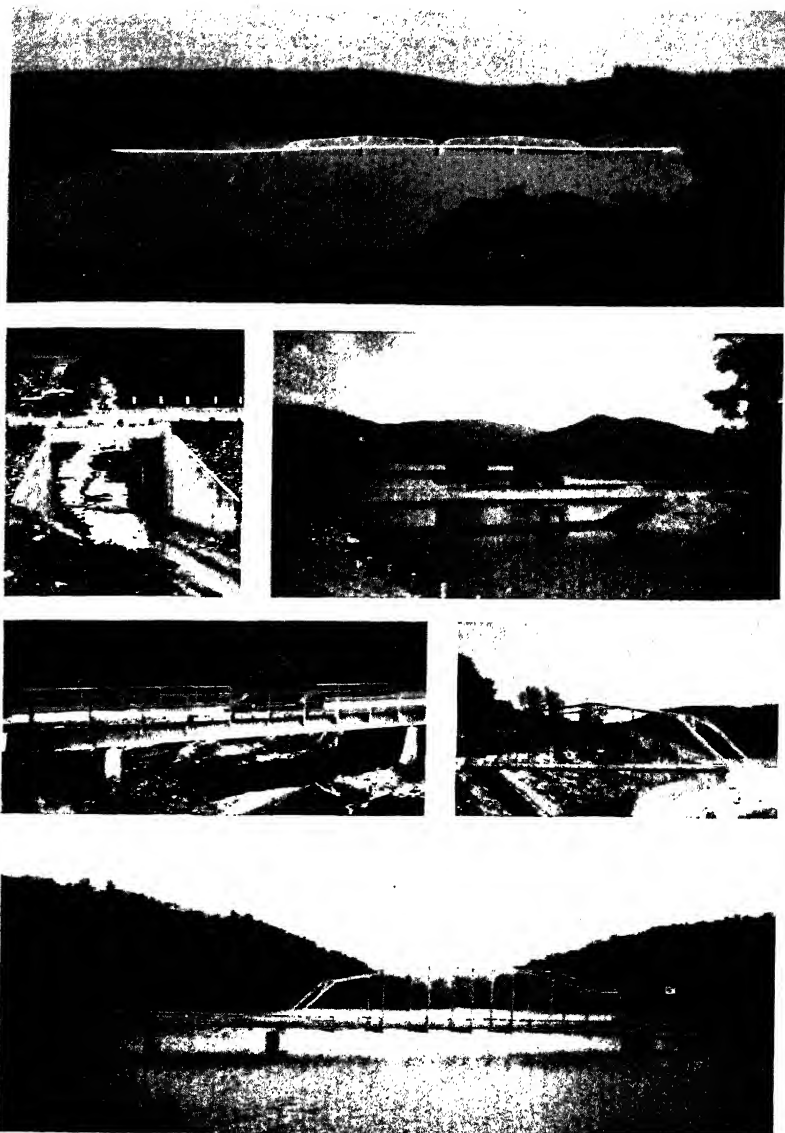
Typical new state and county highway bridges. A. Clinch River Bridge, State Highway 33. B. Little Barren Creek Bridge, Peninsula Road. C. Cove Creek Bridge, State Highway 9. D. Notchy Creek Bridge, Henry's store to State Highway 32. E. Hogskin Creek Bridge, Black Fox Creek Road. F. Cedar Creek Bridge, Primroy-Cedar Creek Road.
